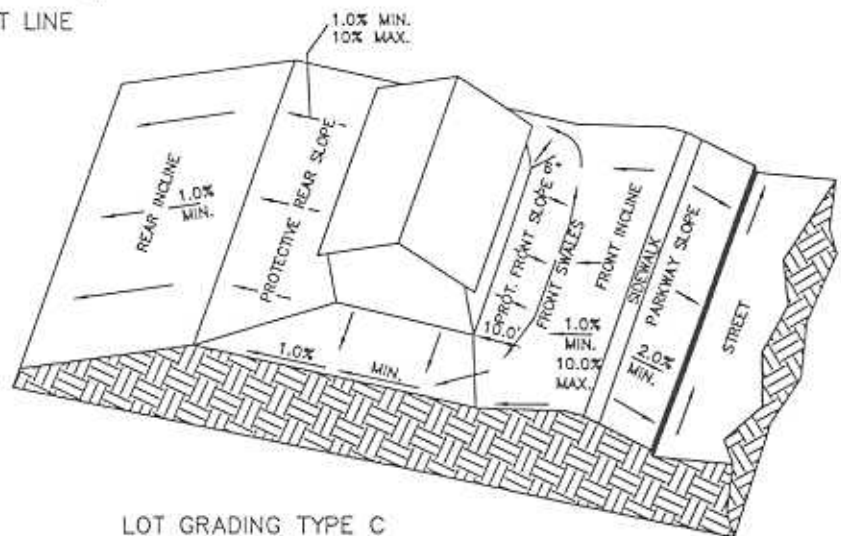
Exhibit K Typical FHA/VA Three Dimensional Grading Plan
